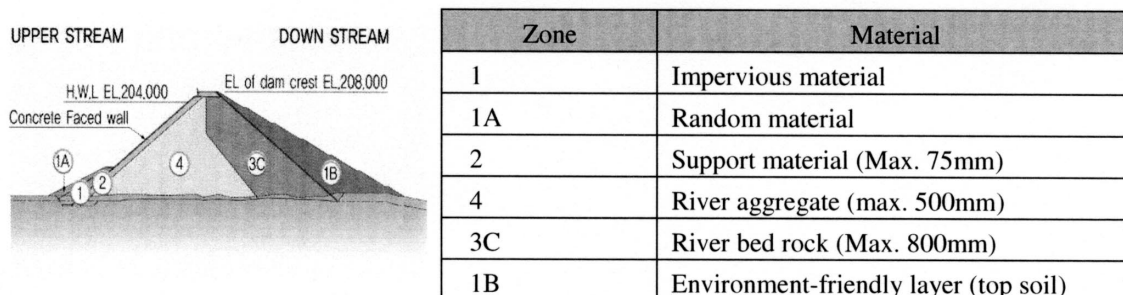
Standard cross section and construction materials of Hwabuk multipurpose-dam
